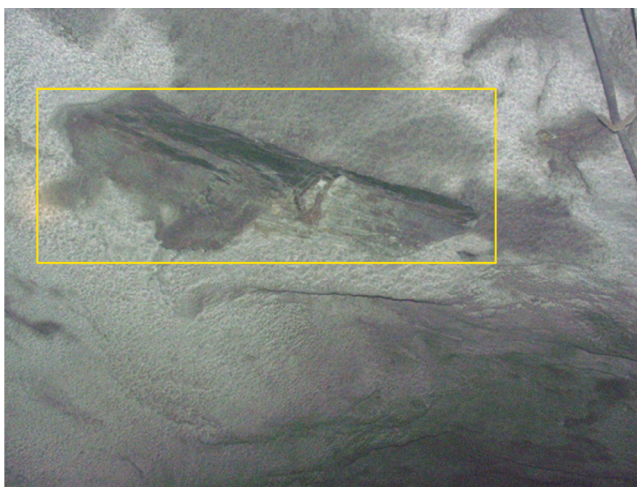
A gravity driven block failure through a freshly sprayed fibre reinforced concrete layer.
